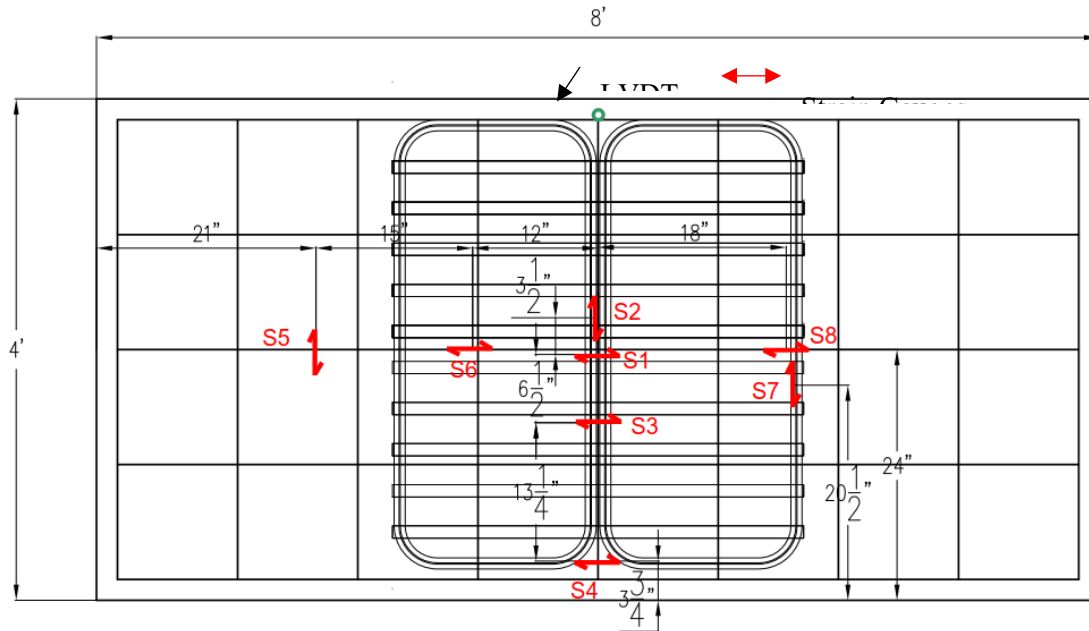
Instrumentation Plan (Vaikasi, 2021)
